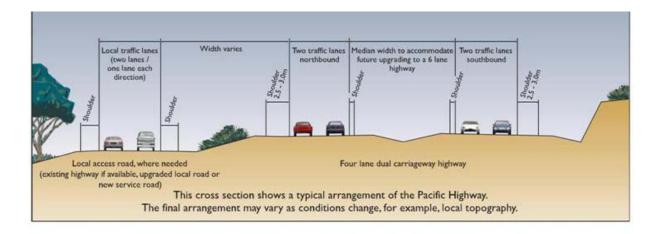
Typical cross-section of a motorway standard road (Class M) (indicative only)
